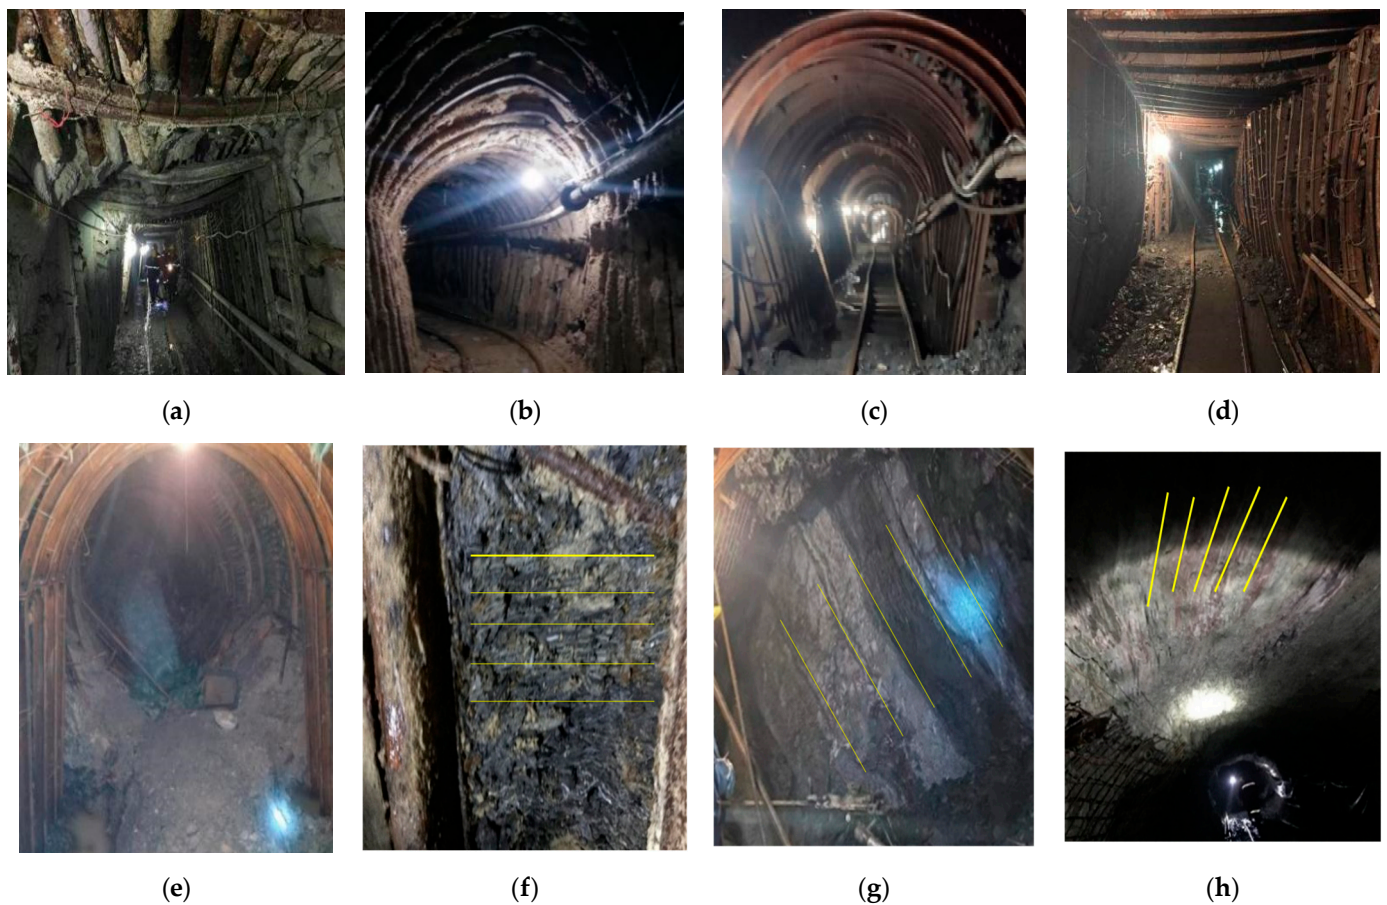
Deformation examples of phyllite roadway support engineering: (a) roof settlement, (b) roof steel frame bending diagram, (c) the feet deformation of a steel frame, (d) deformation of a side steel frame, (e) large deformation of the floor, (f) $\beta = 0^\circ$, (g) $\beta = 45^\circ$ and (h) $\beta = 90^\circ$.
